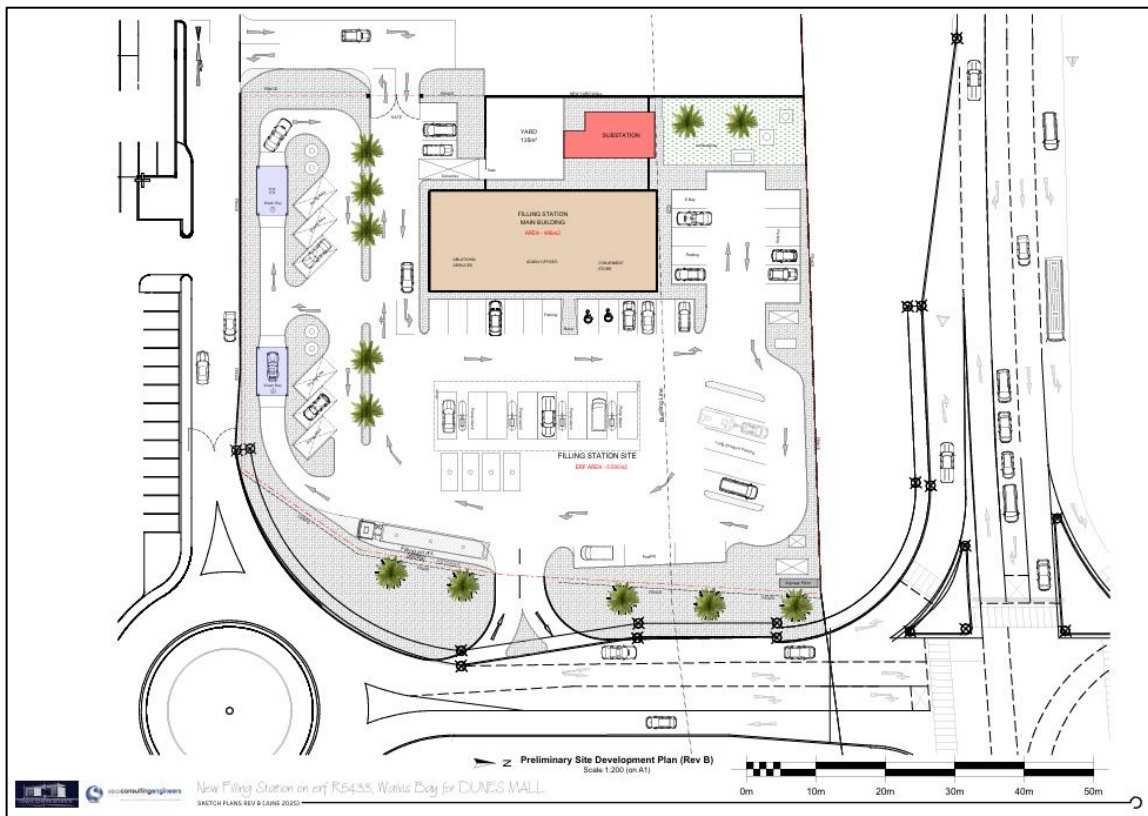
Site Layout Plan (Conrad Scheffer Architects, 2025)
